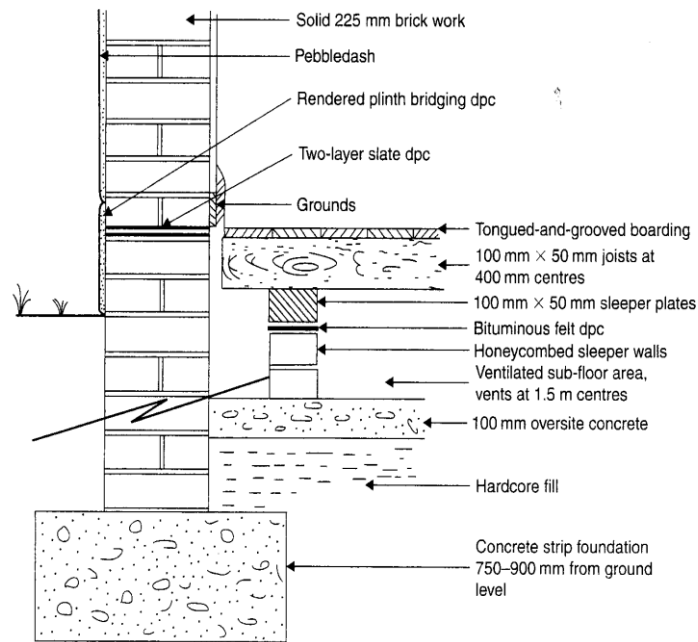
Typical 1930 domestic foundations type (Glover, 2006)
